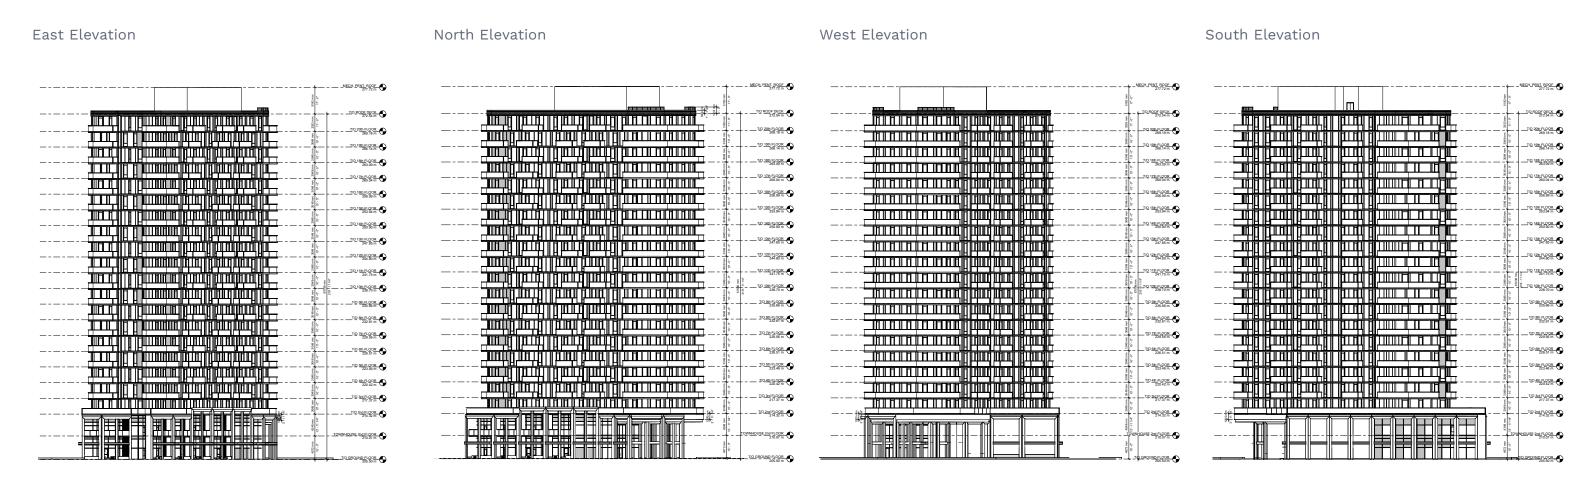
Elevations (Prepared by Chamberlain Architect)
